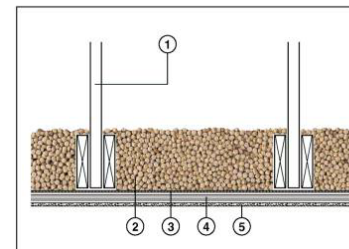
/7/8/9: insulating material for wall, roof, ceilings, floor
